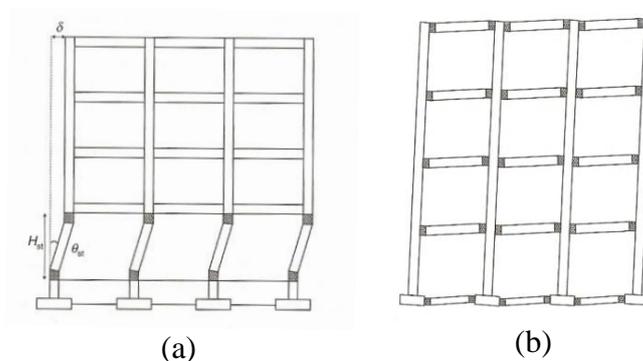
Collapse mechanisms: (a) soft-storey in weak column/strong beam system; (b) beam-sway in a strong column/weak beam system (from Lopes (2008)).
